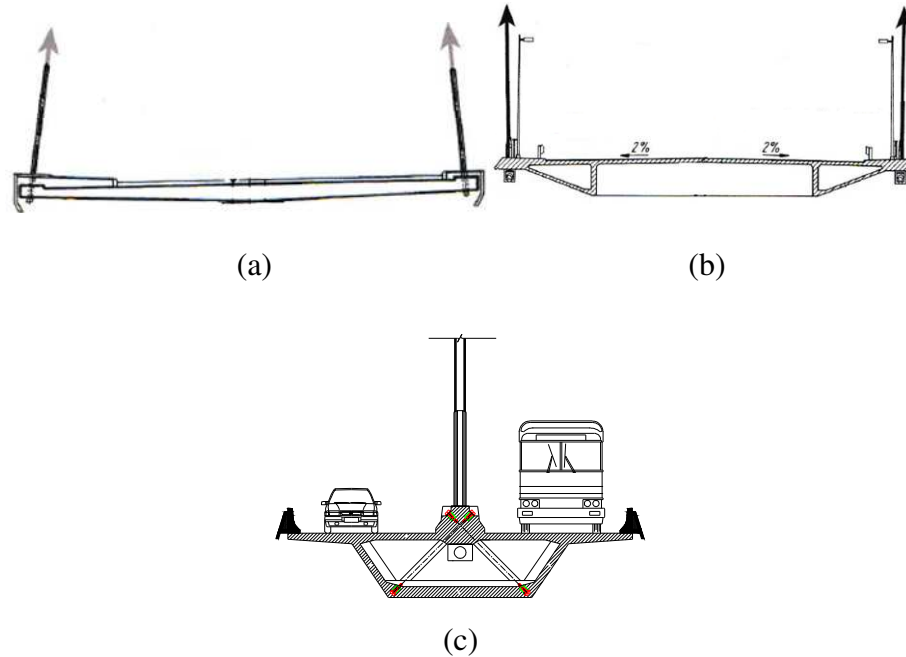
7: Concrete cross-sections: (a) thin concrete beams (Koppel, 1984 apud Svensson, 2012); (b) 2 concrete girders (Leonhardt, 1980 apud Svensson, 2012); (c) box girder (Battista, 2011).
